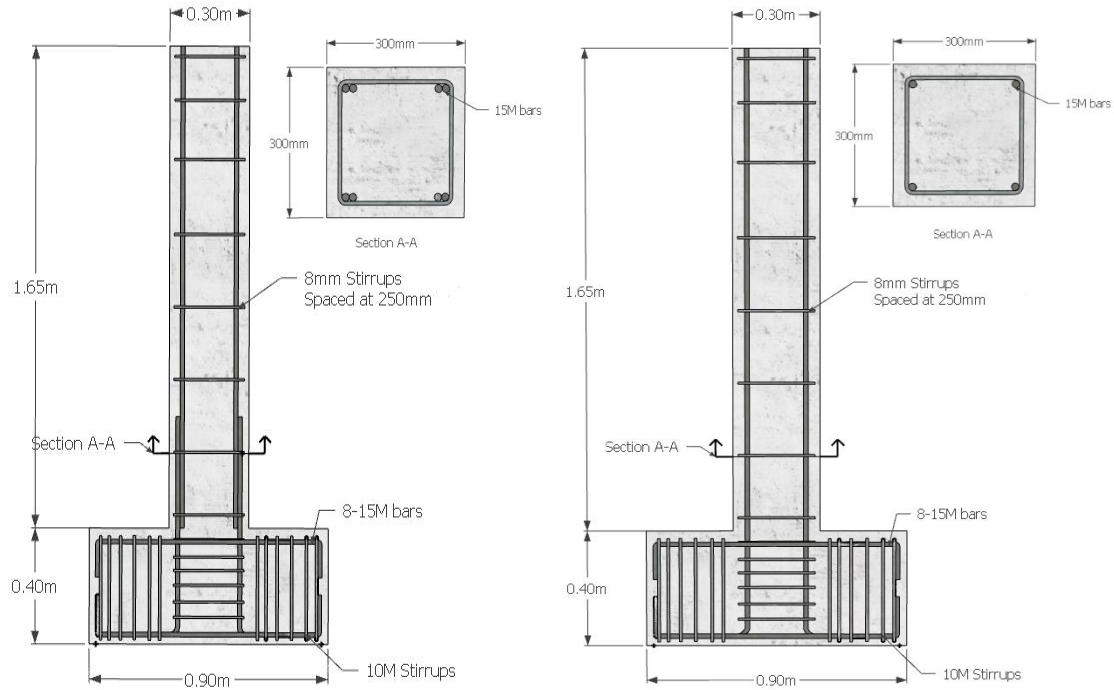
Detailing of standard columns for numerical investigation. Lap-spliced column (left), Anchored column (right)
